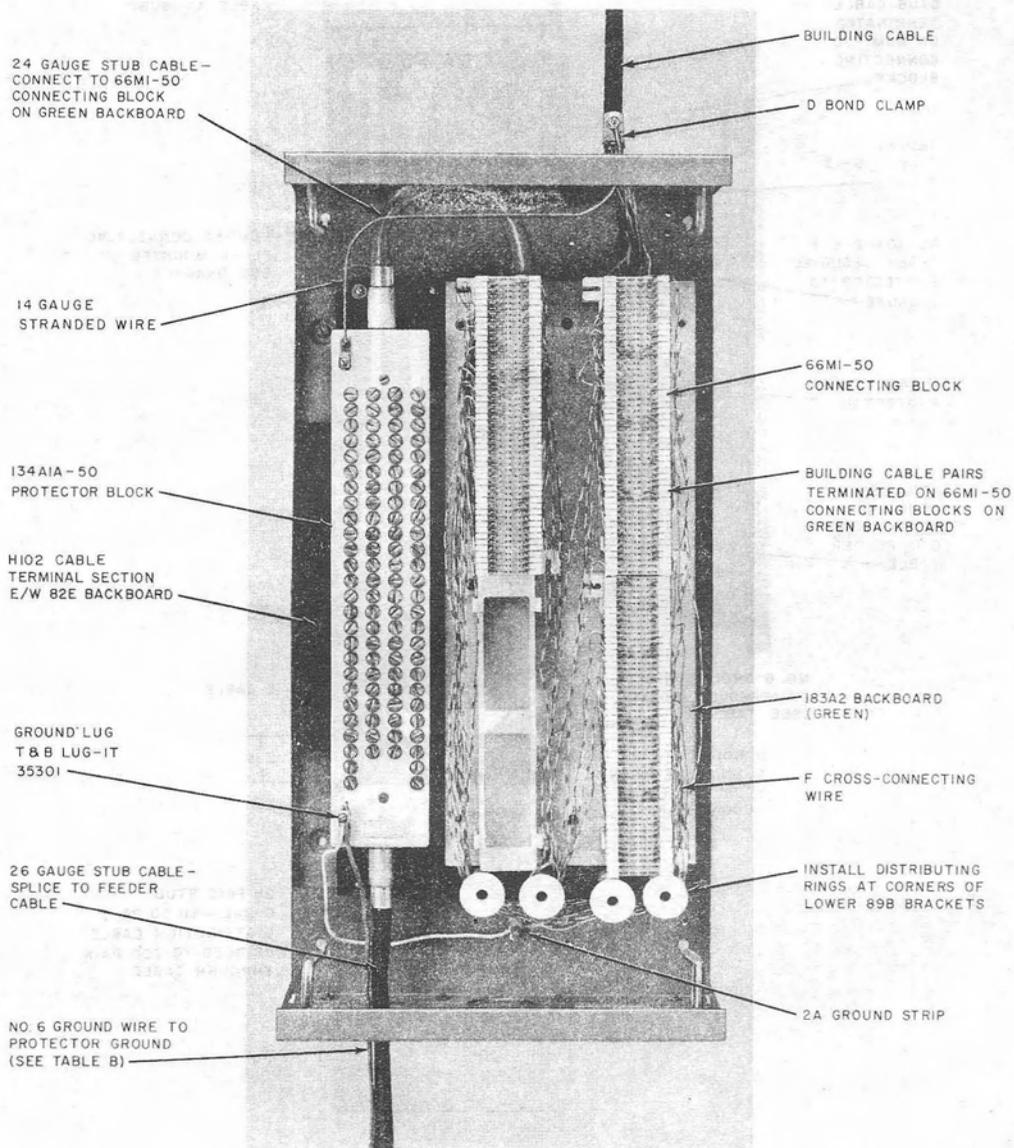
50-Pair Protected Building Terminal Mounted in H102 Cable Terminal Section
